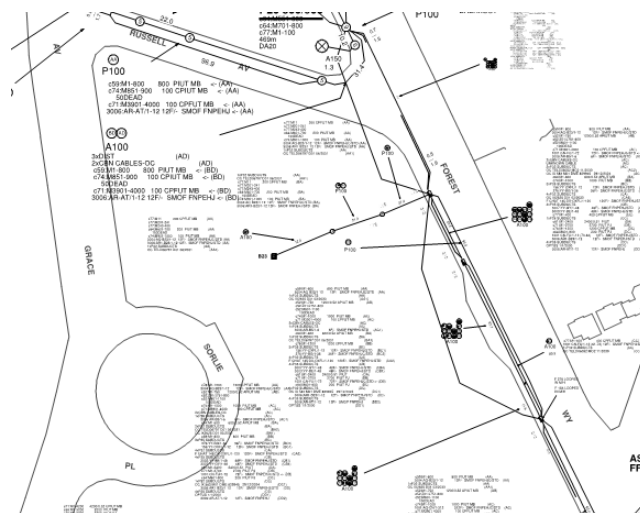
Existing Telstra Cable/Duct/Trench from Forest Way
